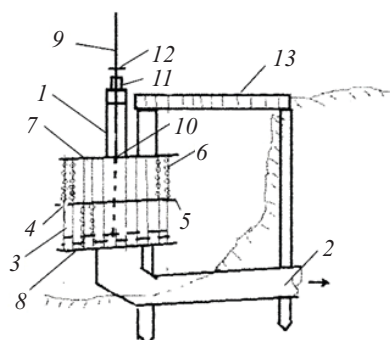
Water intake head [15]: 1 — frame with lifting mechanism; 2 — water intake pipe; 3 — grid; 4 — holes; 5 — ring; 6 — balls; 7 — top cover; 8 — headliner plate; 9 — rod with screw thread; 10 — fastening unit; 11 — nut; 12 — rotation wheel; 13 — shore bridge
